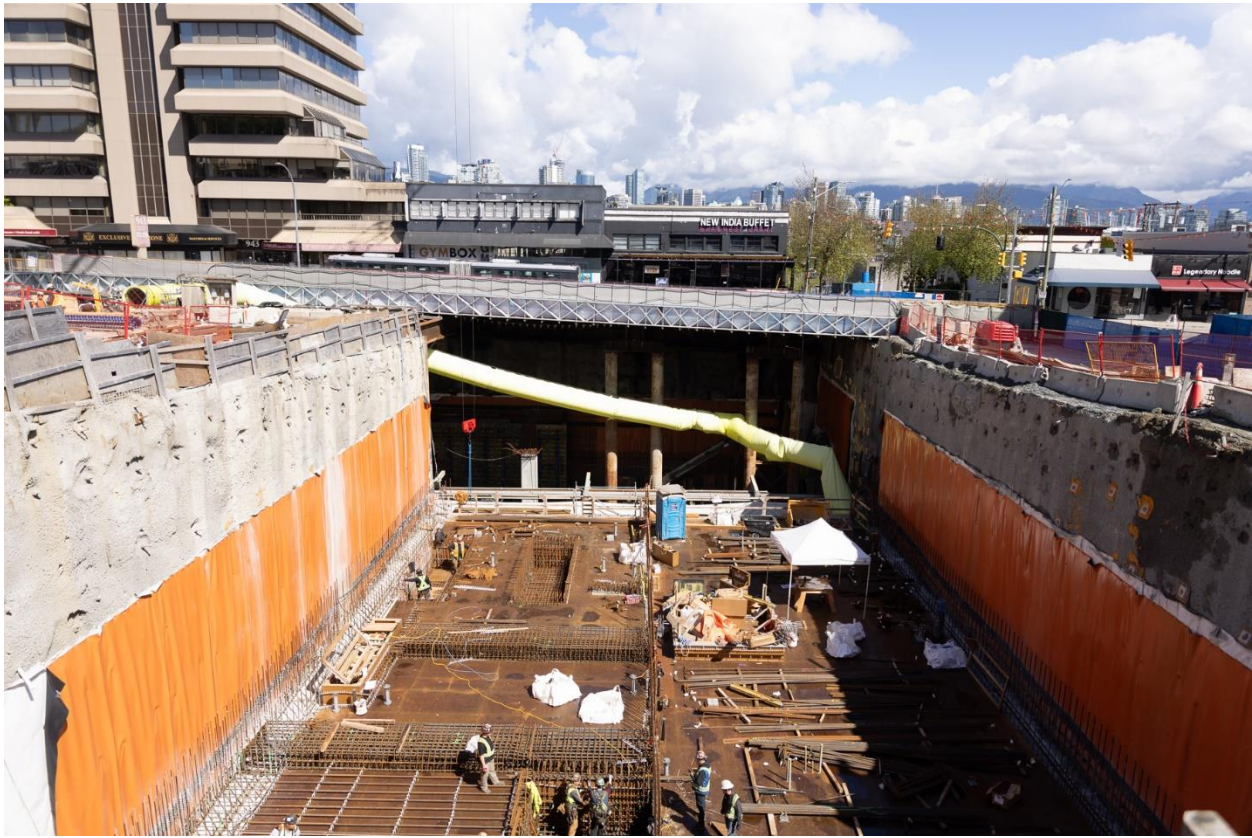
Oak-VGH Station: Progressing with rebar installation for the concourse-level floor in the headhouse.
